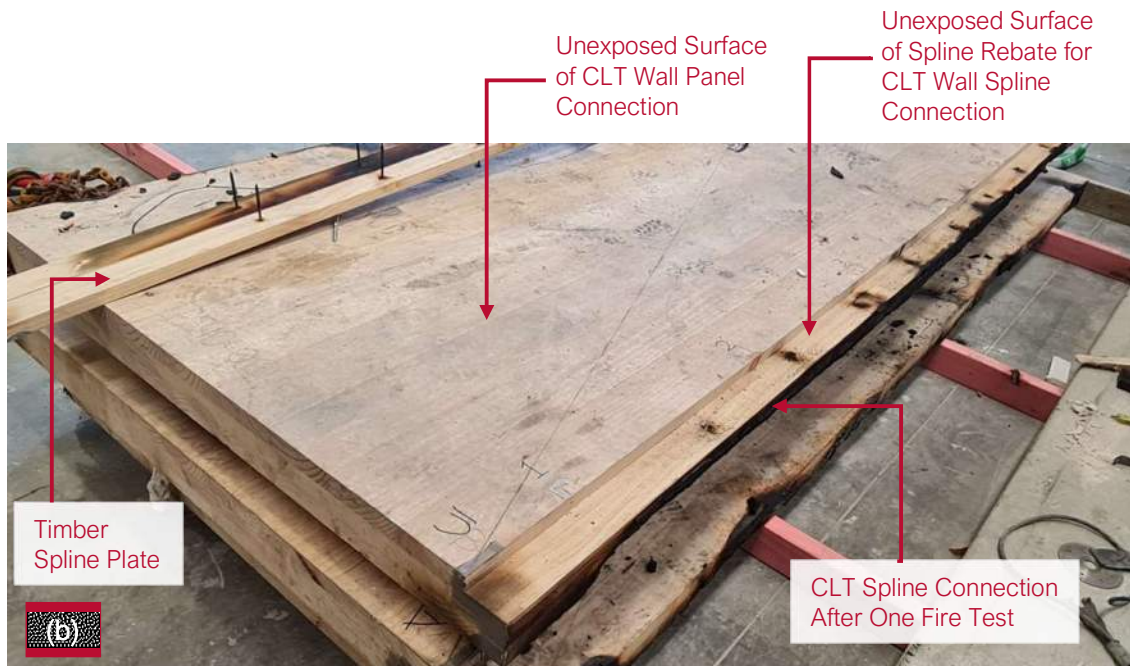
Large-scale Red Stag CLT wall fire test set-up after testing under structural loading to test CLT connection.
